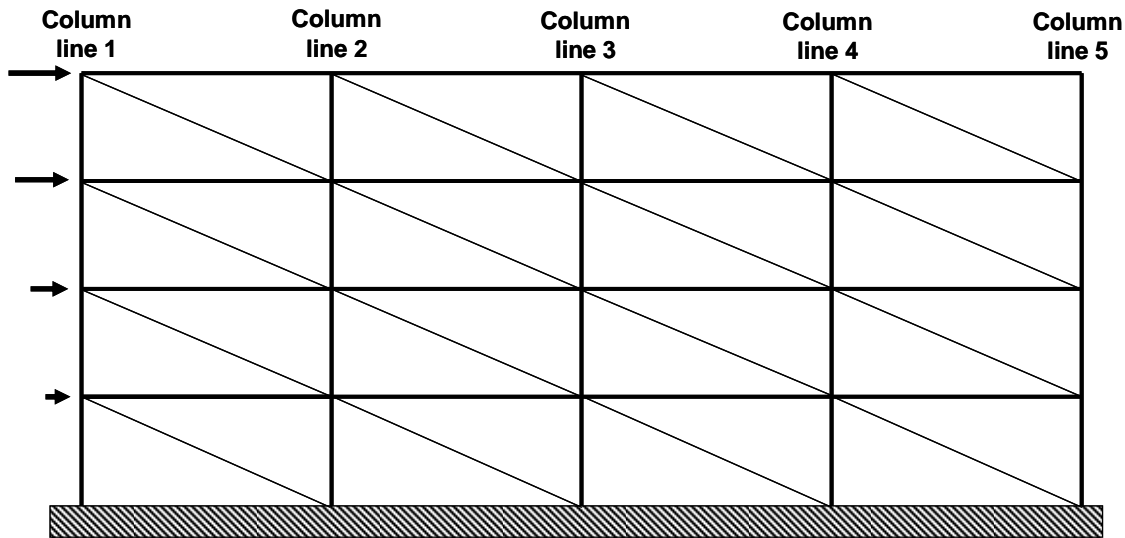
Failure mechanism of ATC-63 steel moment frame and AAC uniformly infilled frame
